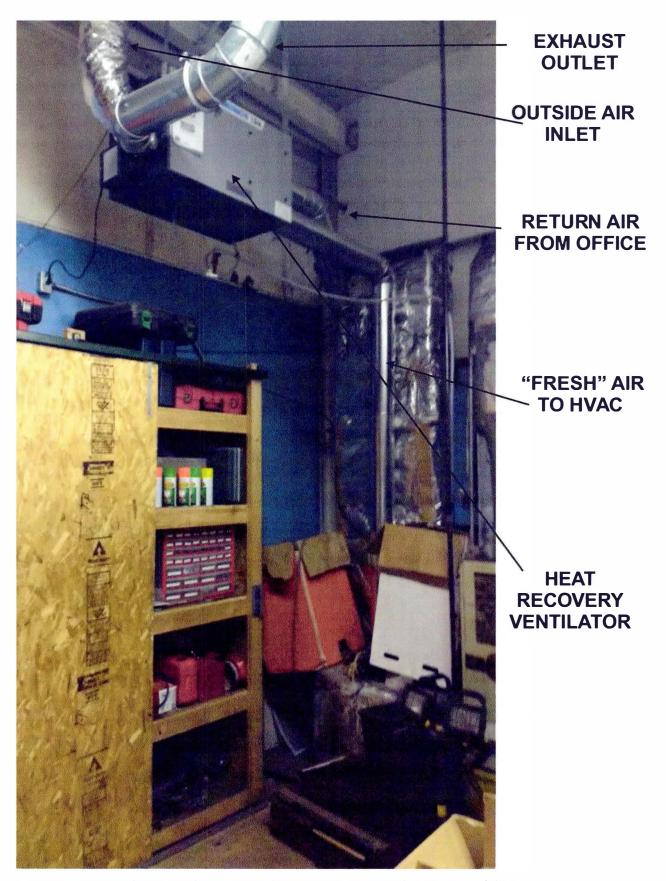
Heat Exchange Ventilator and ducting components. In northwest corner of shop.
